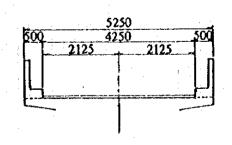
Standard Cross-section of Bridges in Section II-3
